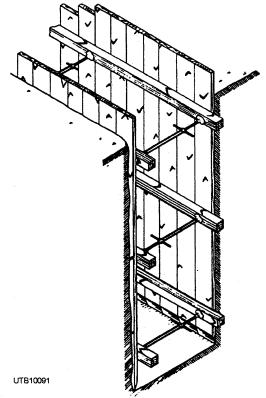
Trench shoring with trench jacks for cross braces.
